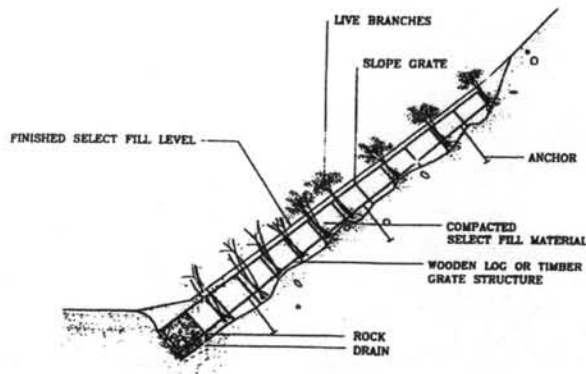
Anchored timber grid used to hold topsoil and slope plantings.
